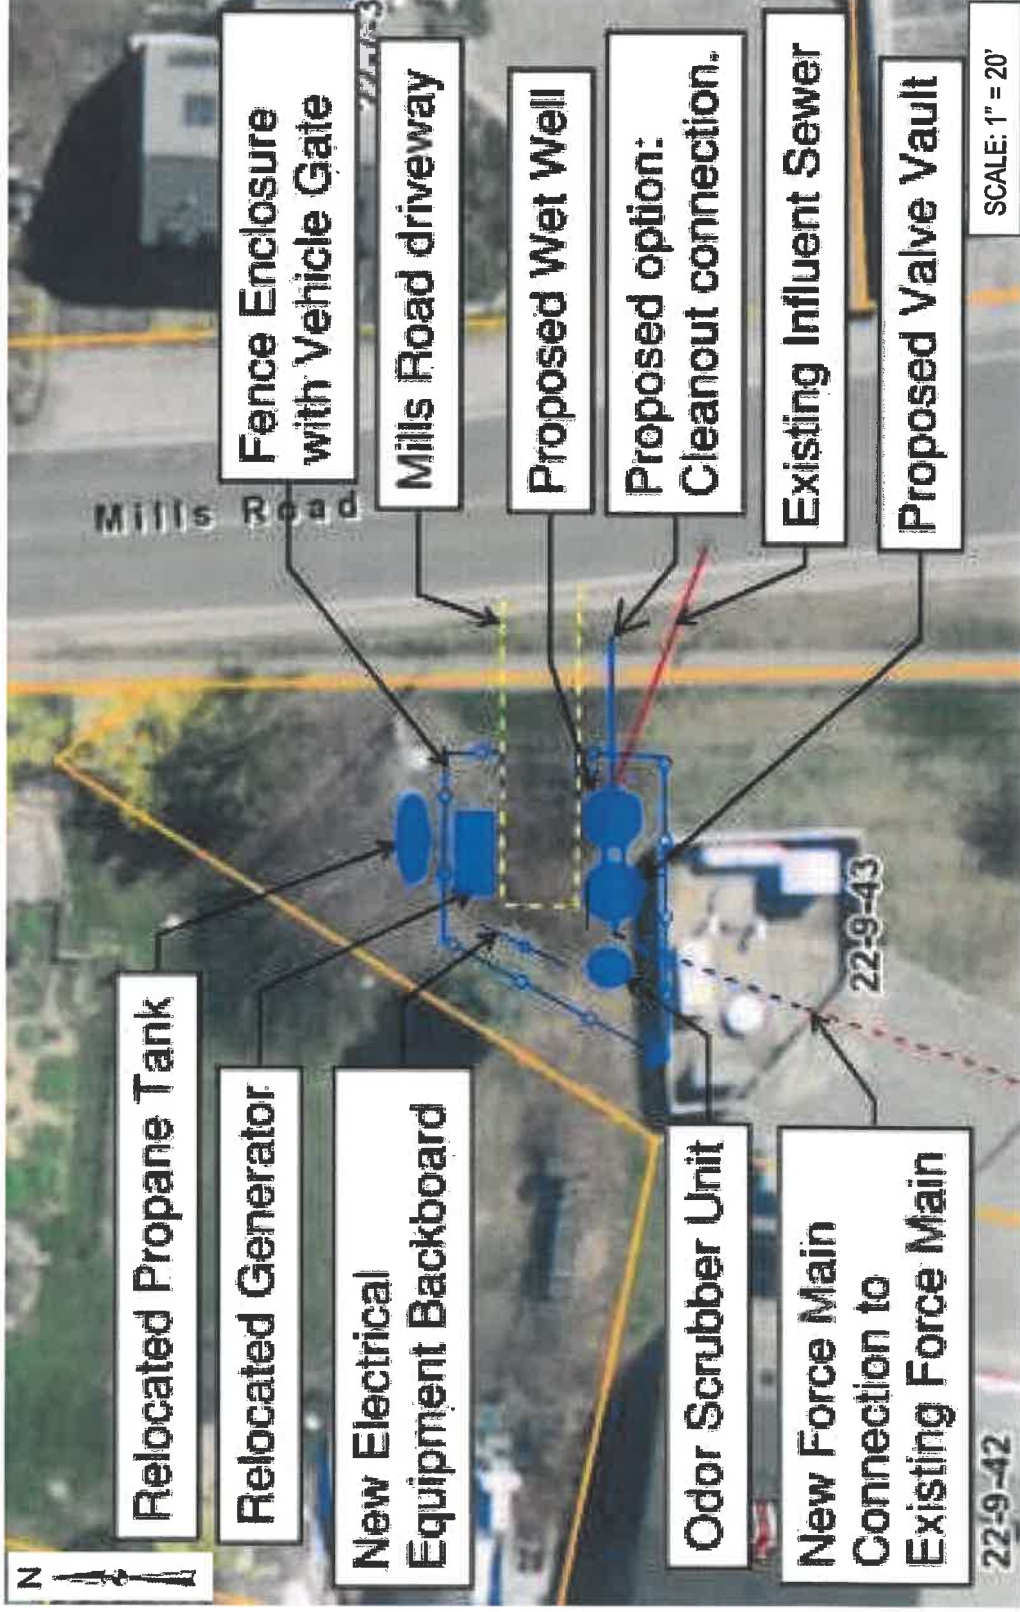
Preliminary Site Layout of Cape Porpoise Pump Station
